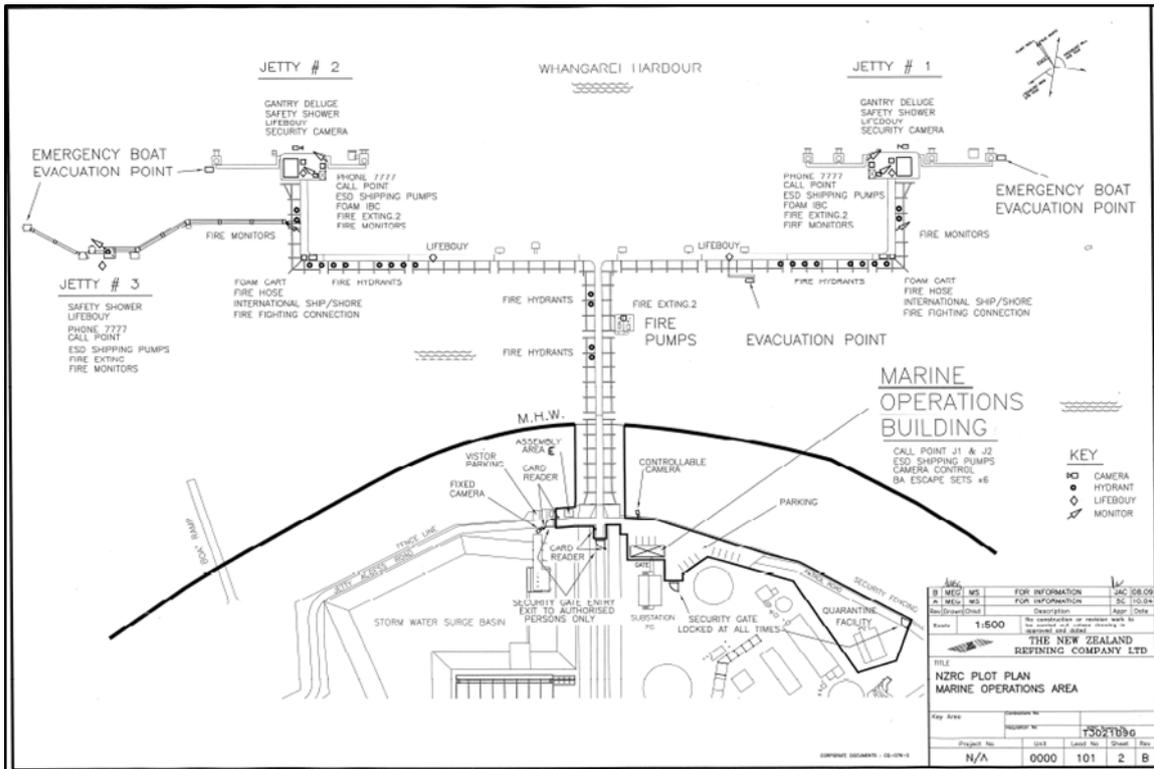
Refining New Zealand's jetty layout (source Refining NZ Port and Terminal Handbook 2017)
